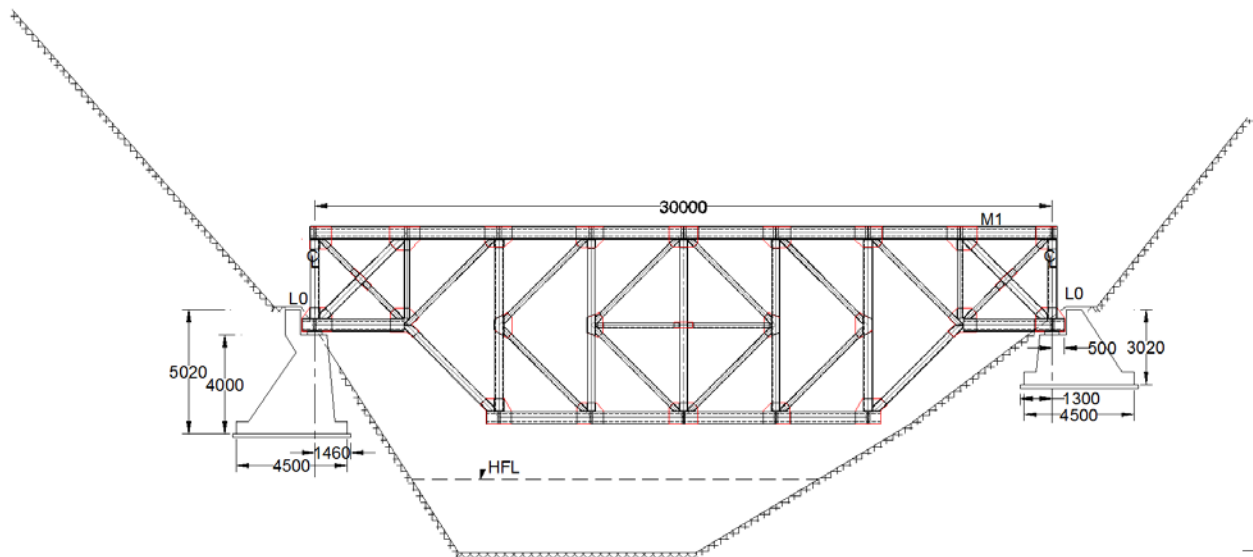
Valley profile and 30.0m span semi deck type bridge
